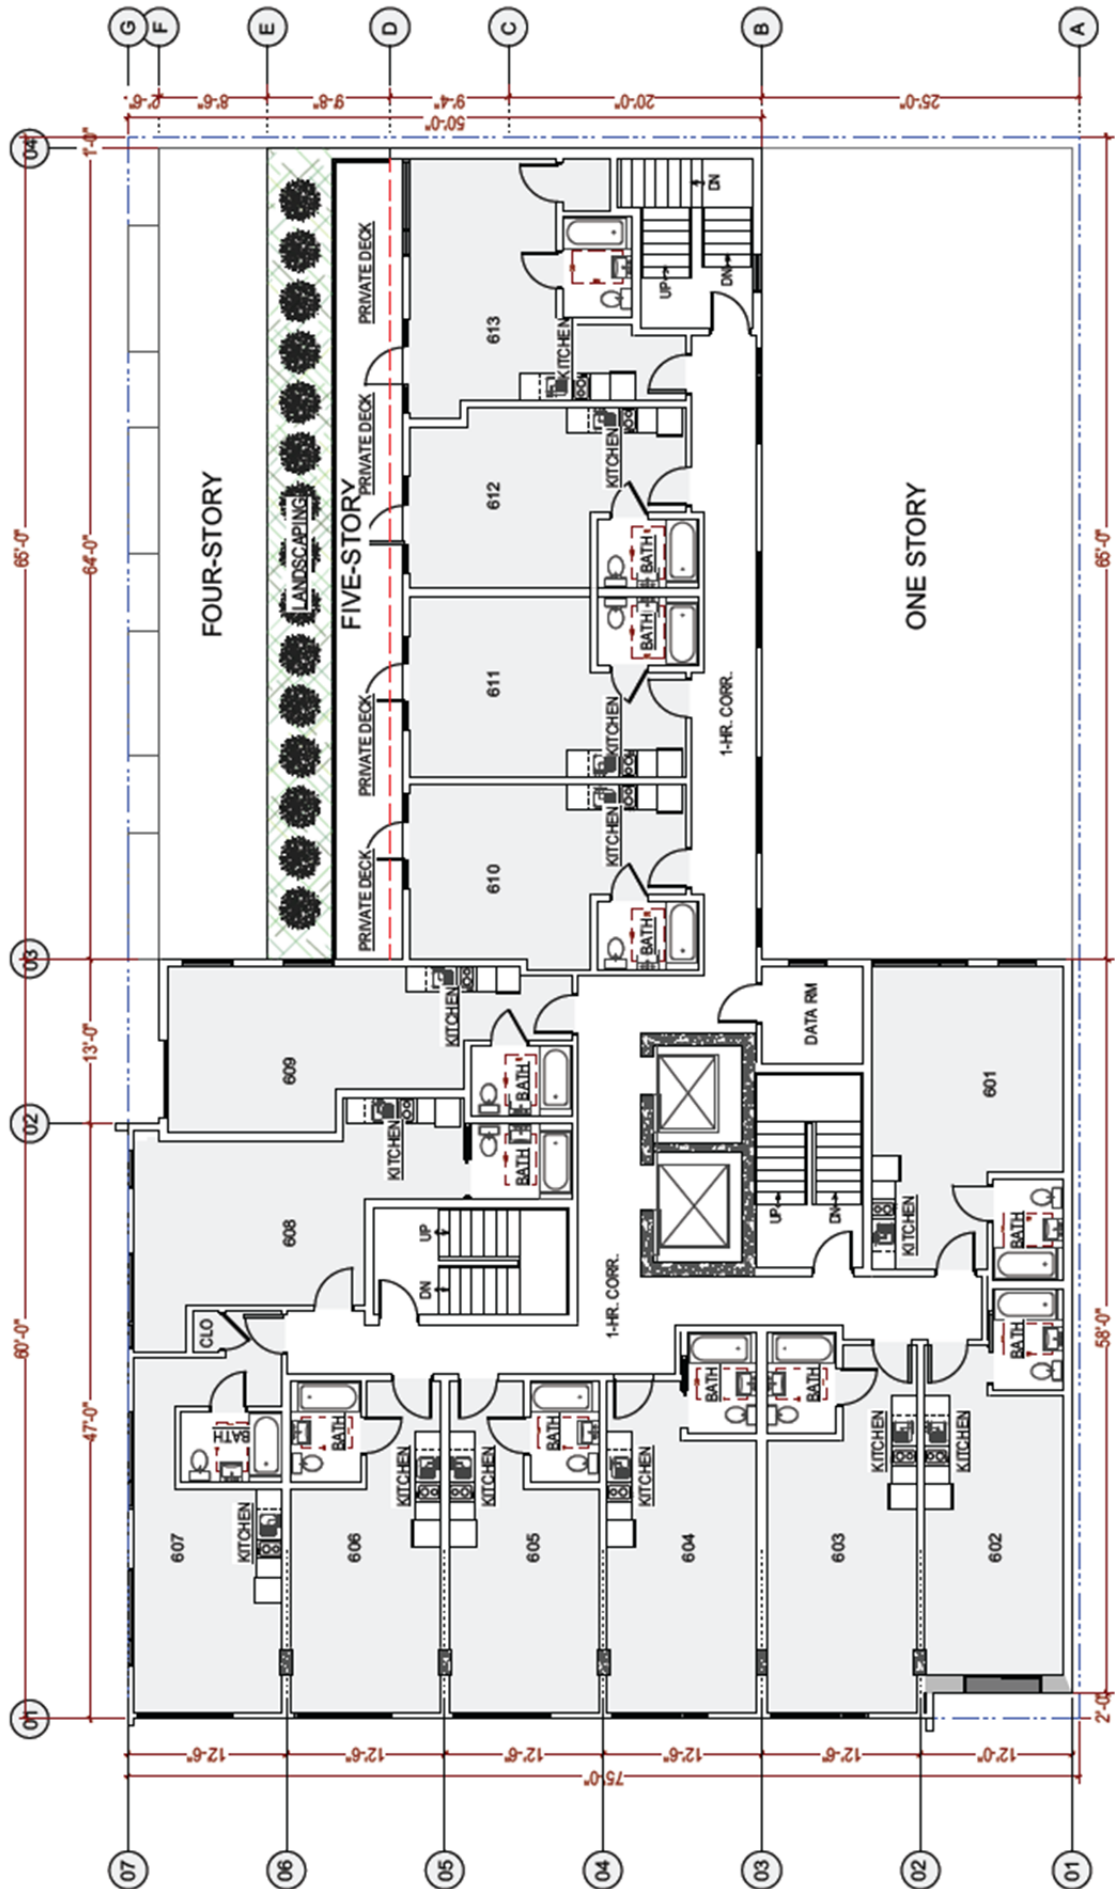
PROPOSED SIXTH FLOOR PLAN
